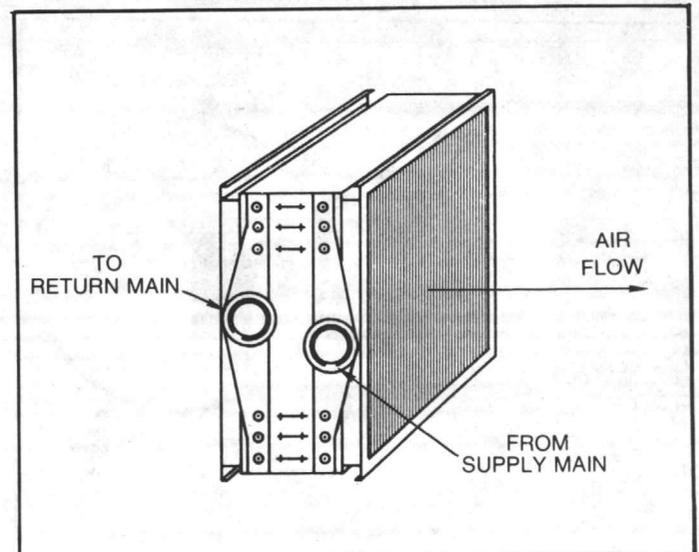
Typical Piping for Type D, W or K Water Cooling Coils with End Connections.
